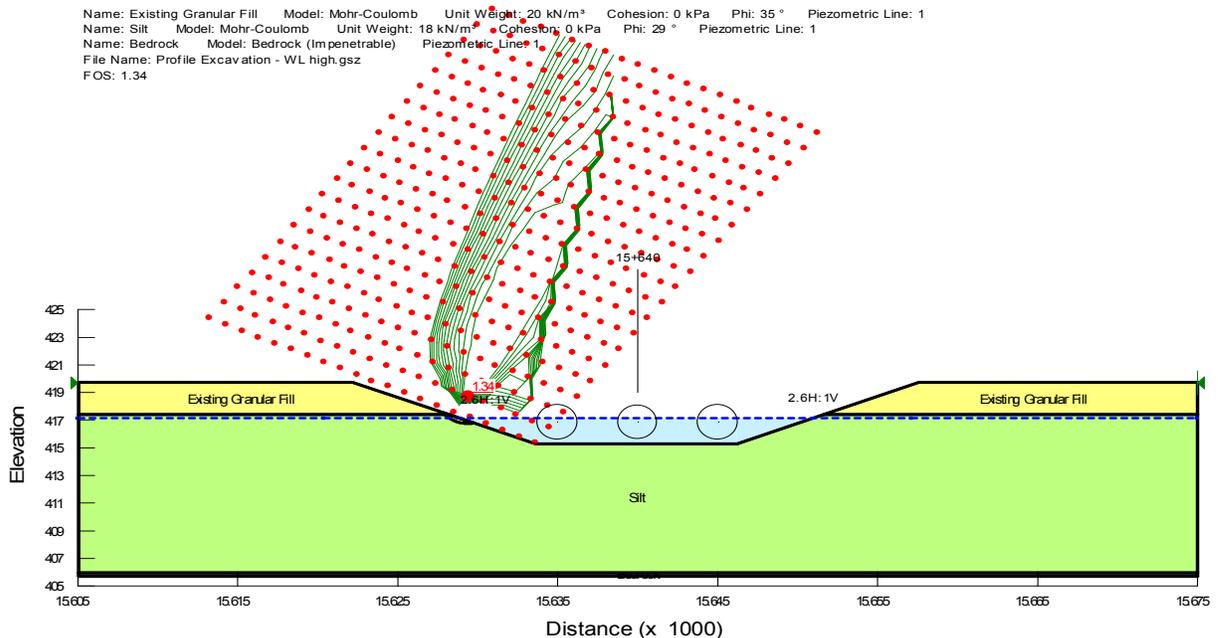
Culvert Excavation and Staging, Cross Section
